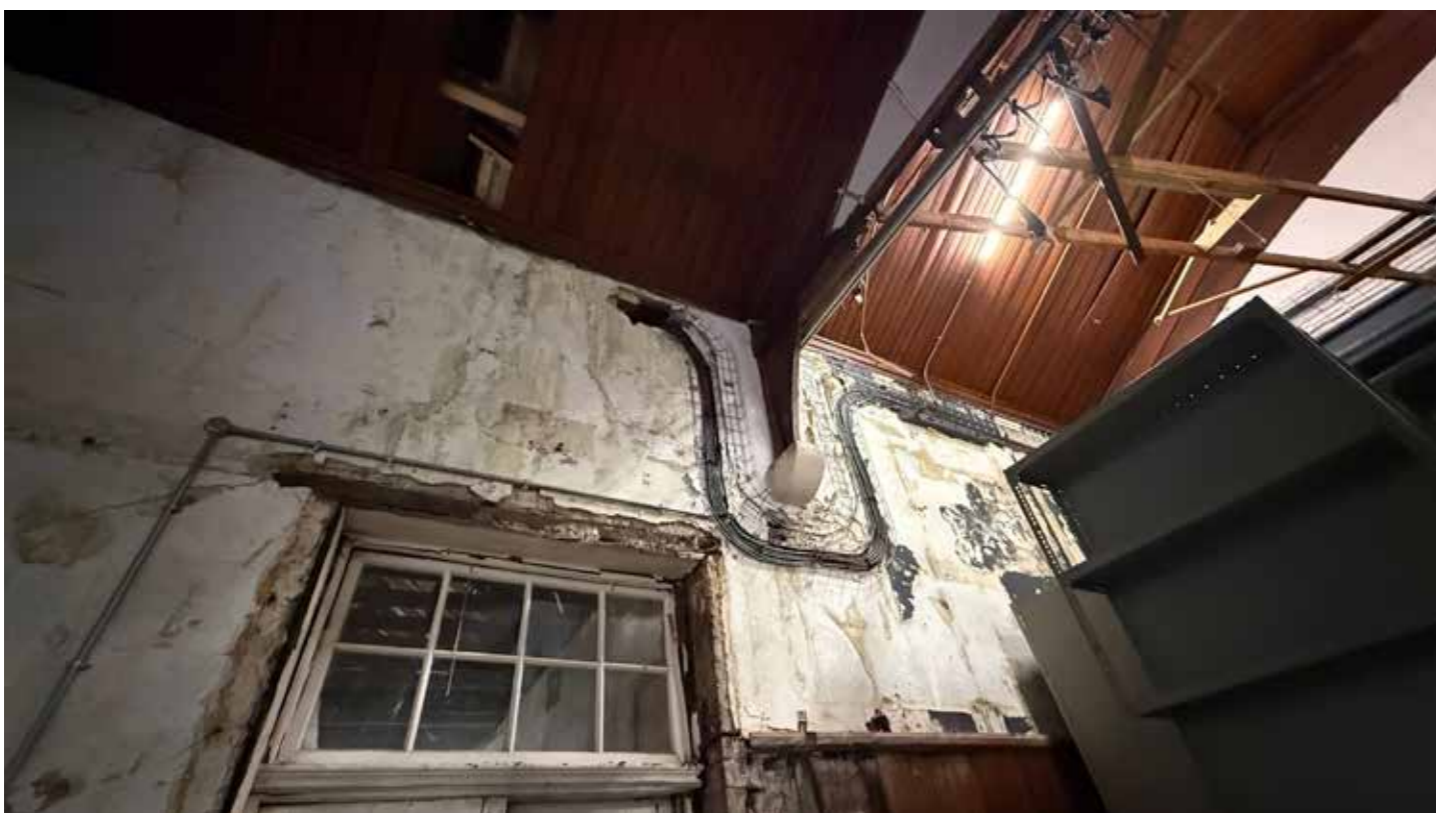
Areas of severe damage should be addressed and agreement as to whether these are left for future repair or whether an interim measure is necessary (RSA, April 2026)
